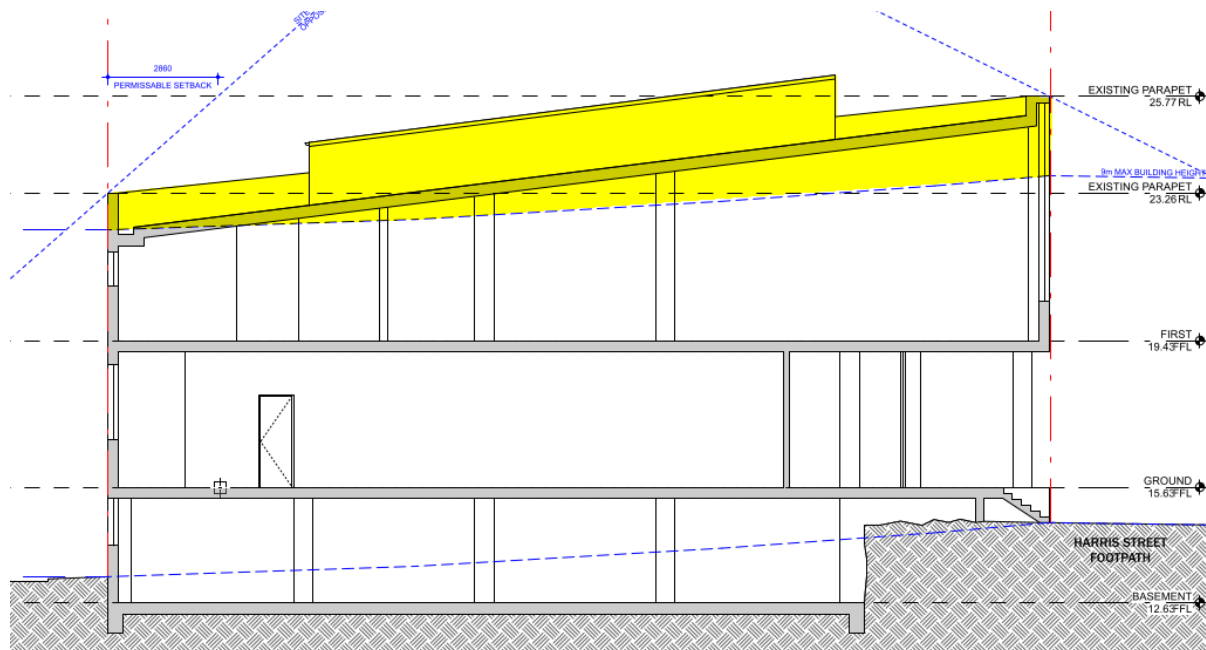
Existing cross section with central roof form exceedance over the 9m building height limit highlighted in yellow
